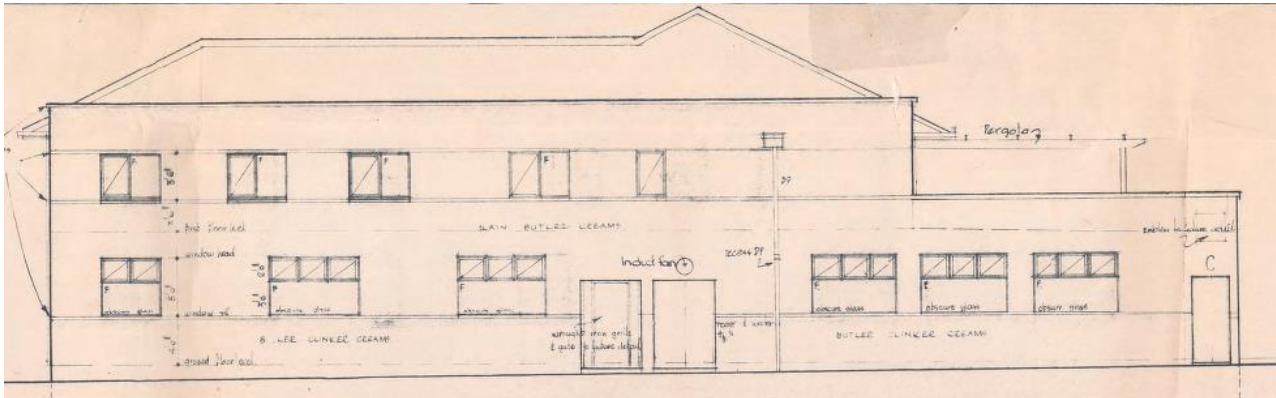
East elevation. Drawing related to building permit 57/1421. (Best Overend Architects, 1960) (Source: Council Building File)
